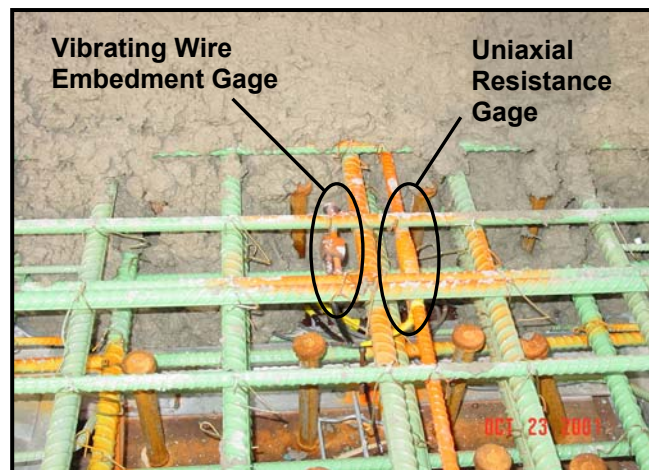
Typical strain gage placed at each location within the concrete deck
